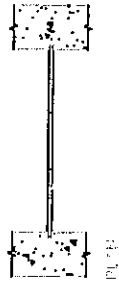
DETAIL OF EXISTING CONCRETE CULVERT SLEEVE
